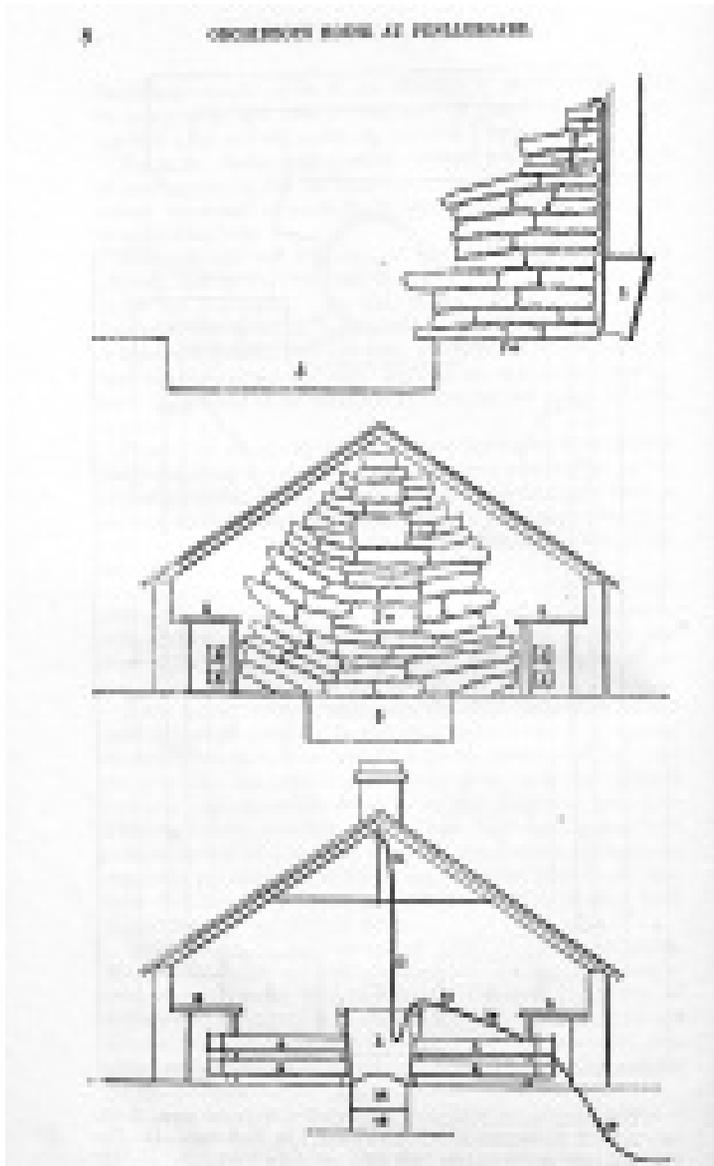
Sections of Orchid House (from Llewelyn 1846).
